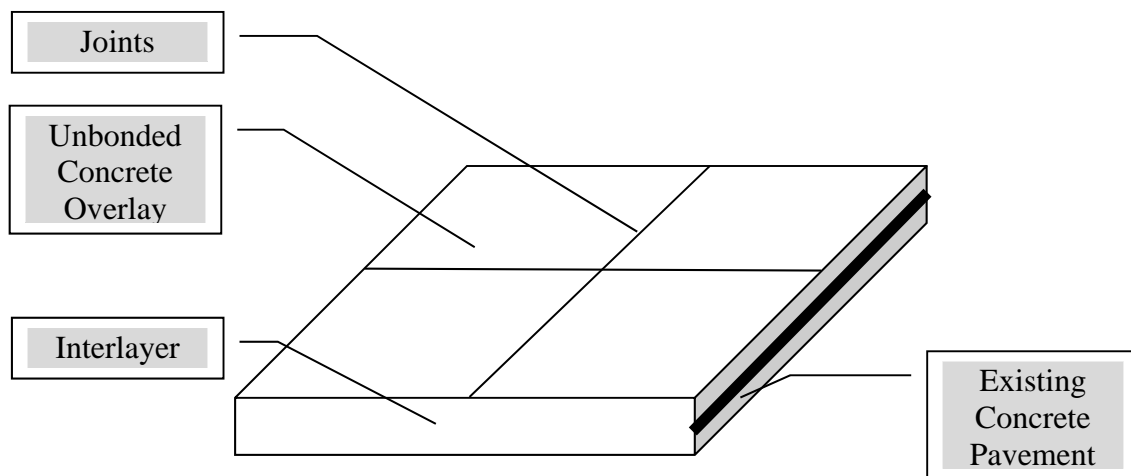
Unbonded concrete overlay of concrete pavement. (Illustration: Joe Mahoney)
